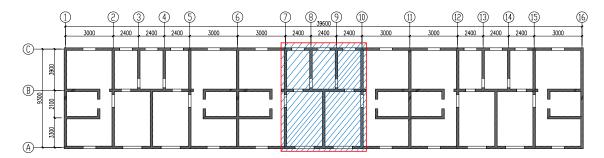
Plane of the unreinforced masonry structure model (unit: mm).
